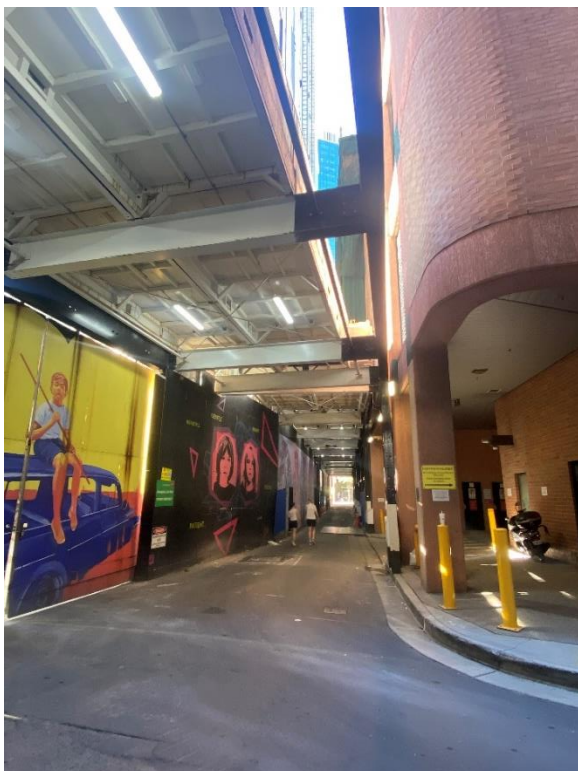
Existing gantry hoarding along Underwood Street (hoarding erected in association with Lend Lease development of 'Sales Force' tower immediately to the north of the site)
